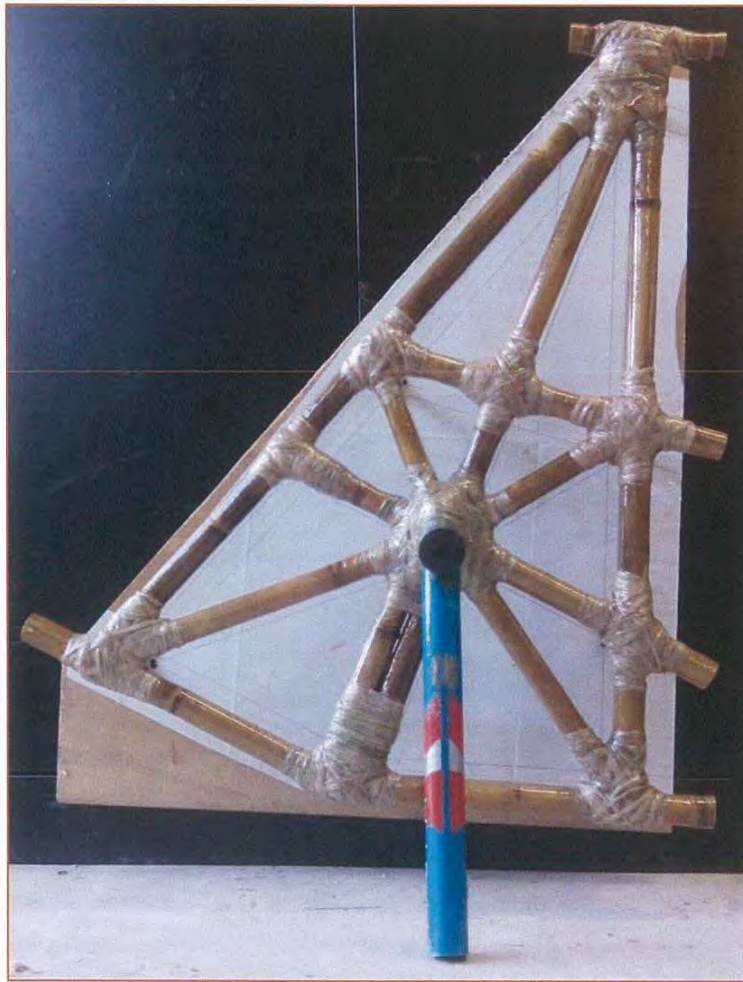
Final prototype frame with wrapped joints and load attachment point mounted
